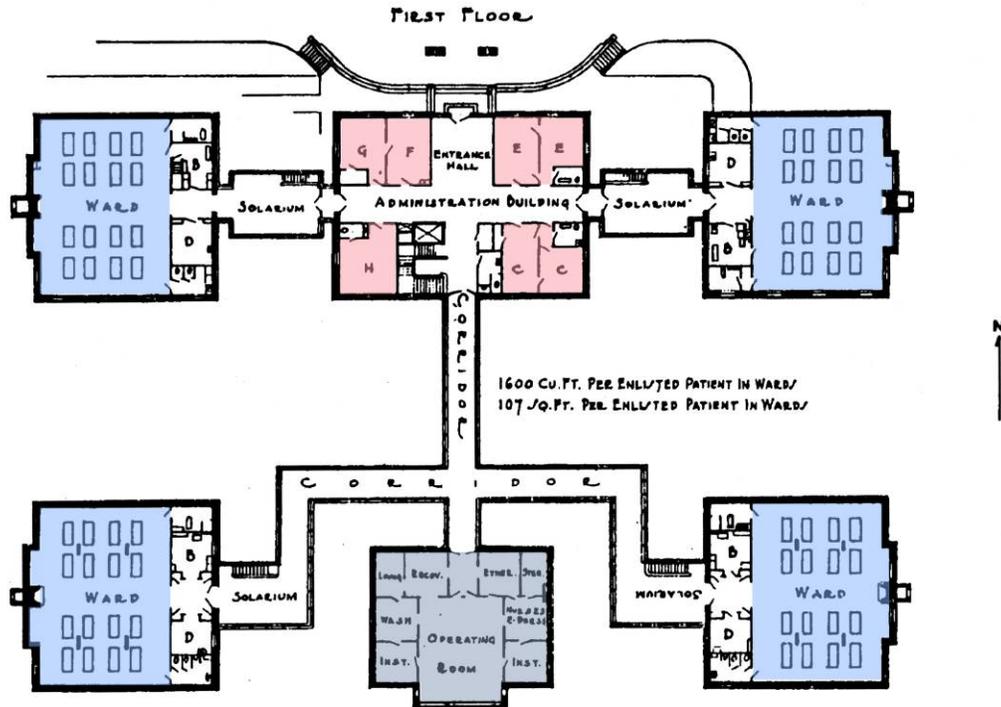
First floor plan for Naval Hospital Washington, DC, circa 1910s (courtesy BUMED).
